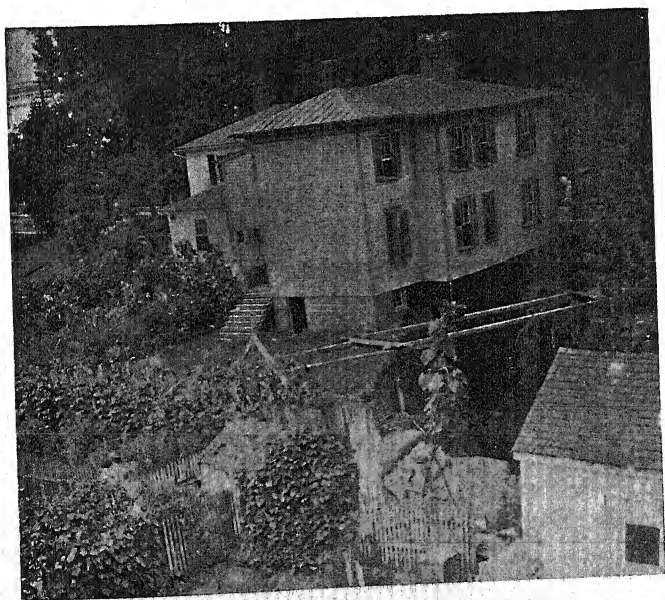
PLATE XLVII, FIG. 2. — View looking along line of limestone cavern, Staunton, Va., showing some of the damage caused by the clay roof of cavern collapsing.
